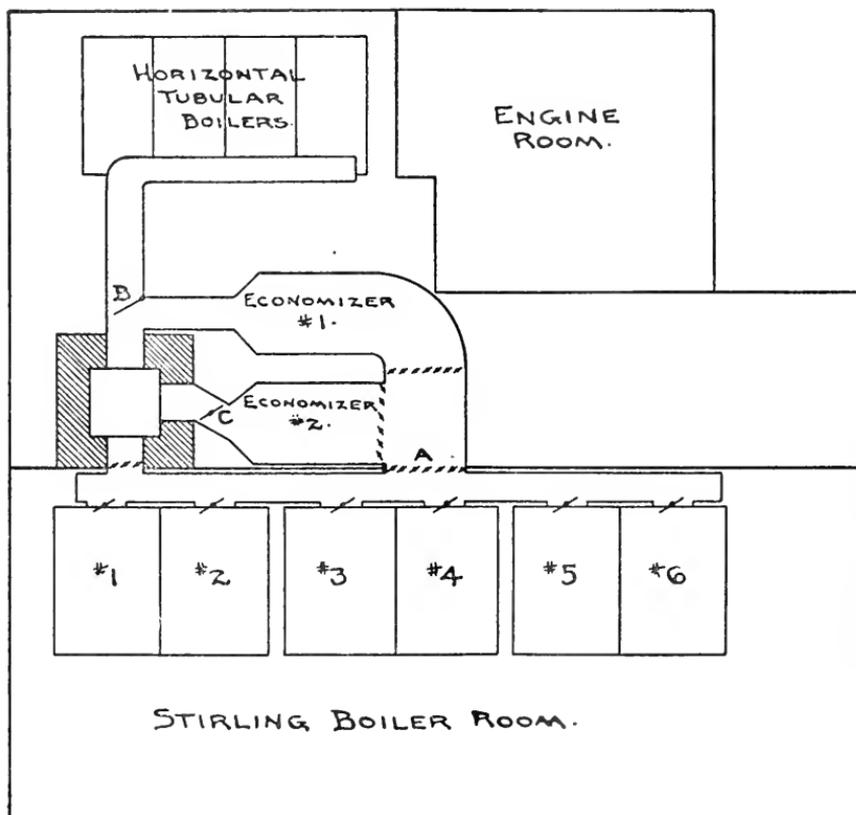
PLAN SHOWING ARRANGEMENT OF BOILERS AND ECONOMIZERS.
